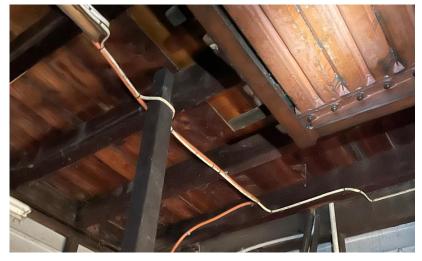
Underside of timber beams and deck flooring of the first floor
